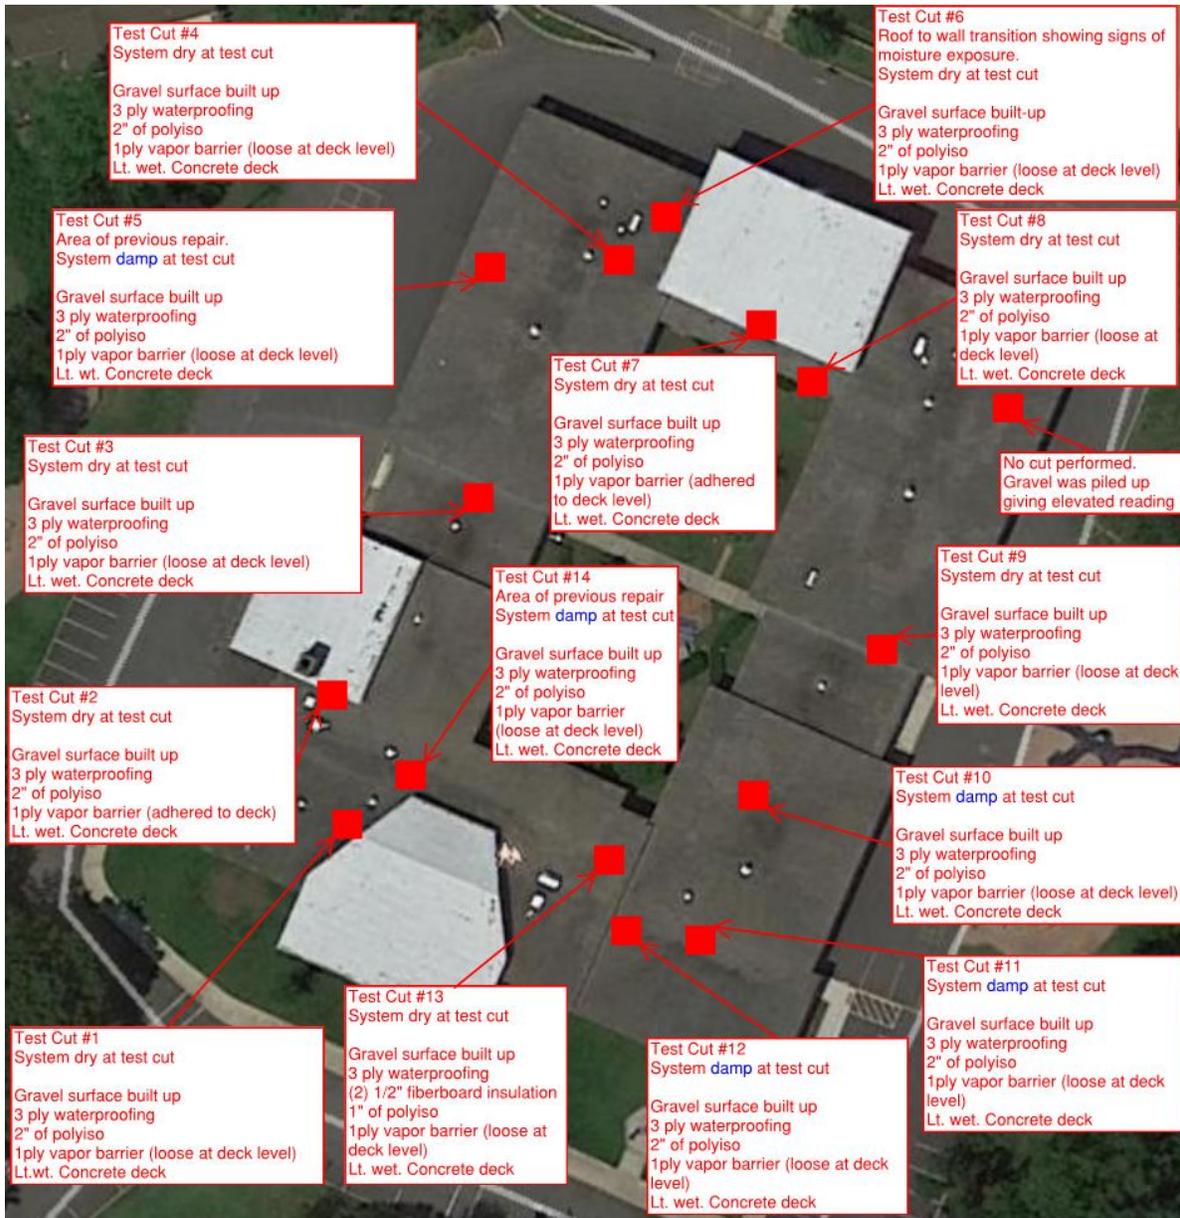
Dunning Elementary School – Partial Roof Area Plan – Approximate Test Cut Locations
